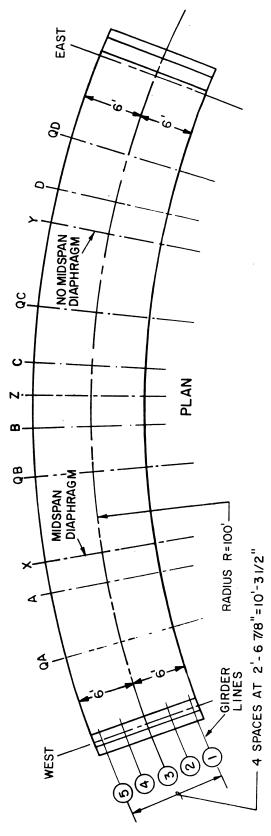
FINAL LOAD TEST ON CURVED BOX GIRDER BRIDGE MODEL
